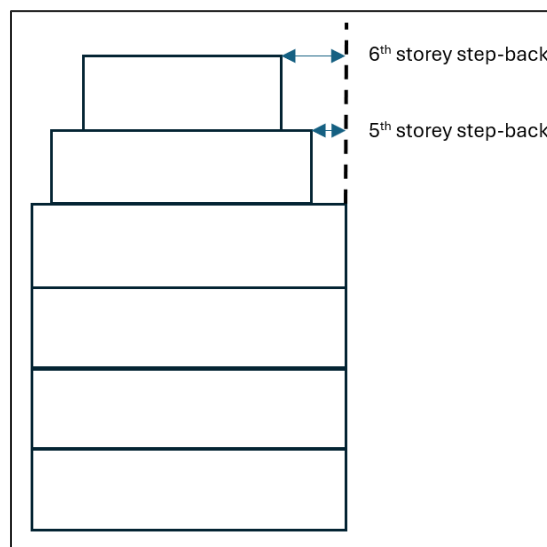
Simplified representation of six storey building with 5th and 6th storey step-backs – side view of building.
